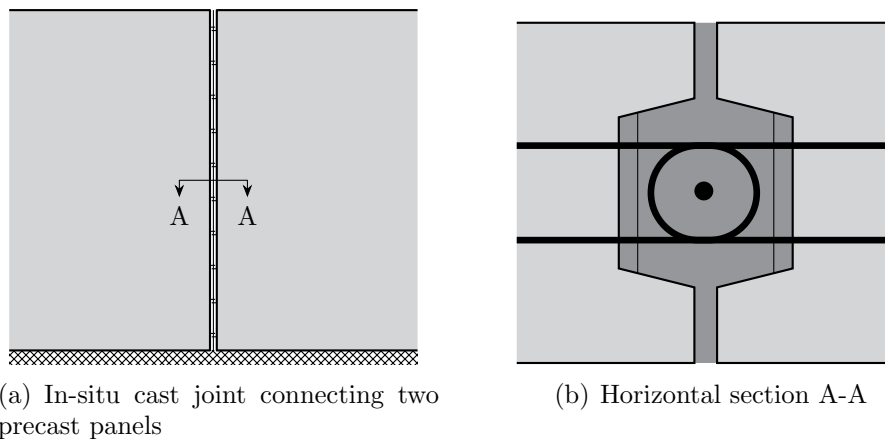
a) Precast concrete panels connected by in-situ cast joints. b) Horizontal section of a keyed joint reinforced with U-bar loops and a locking bar in the centre.
